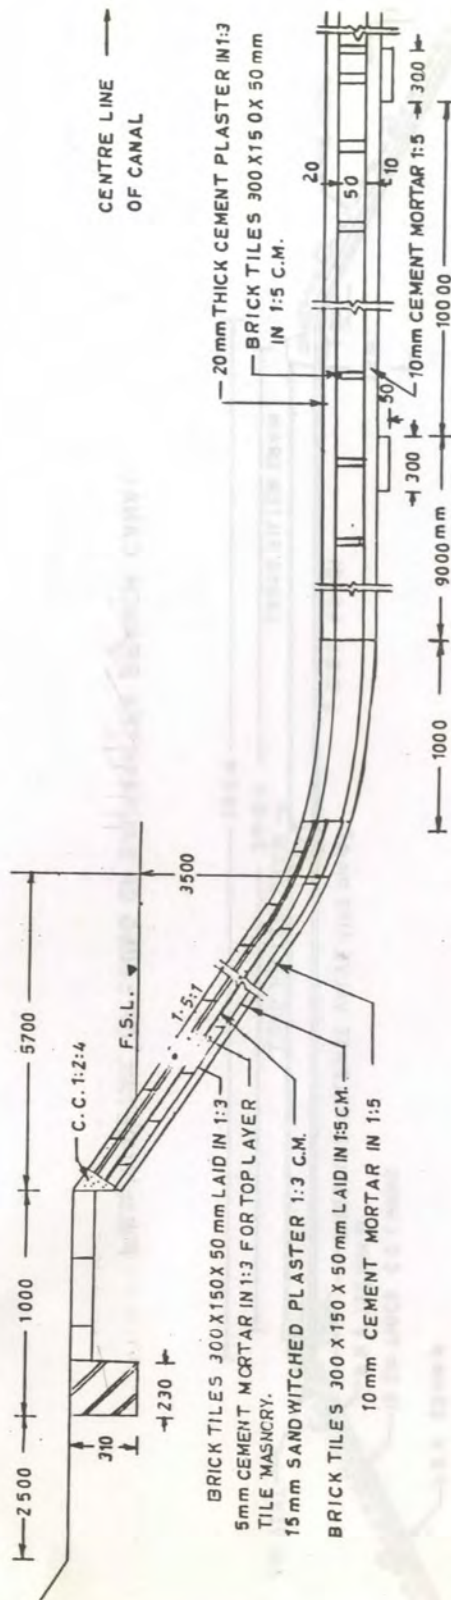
DETAILS OF LINING OF MADHYA GANGA CANAL
